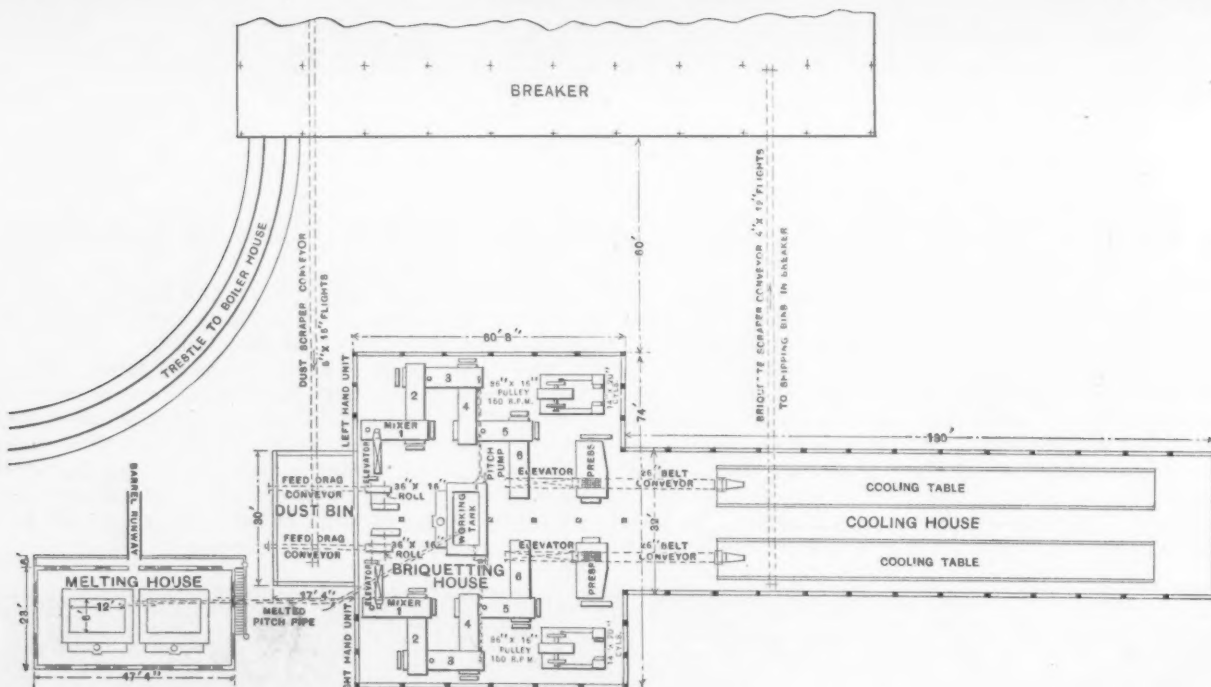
Plan of the Two-Unit Coal Briquetting Plant at Bankhead.
